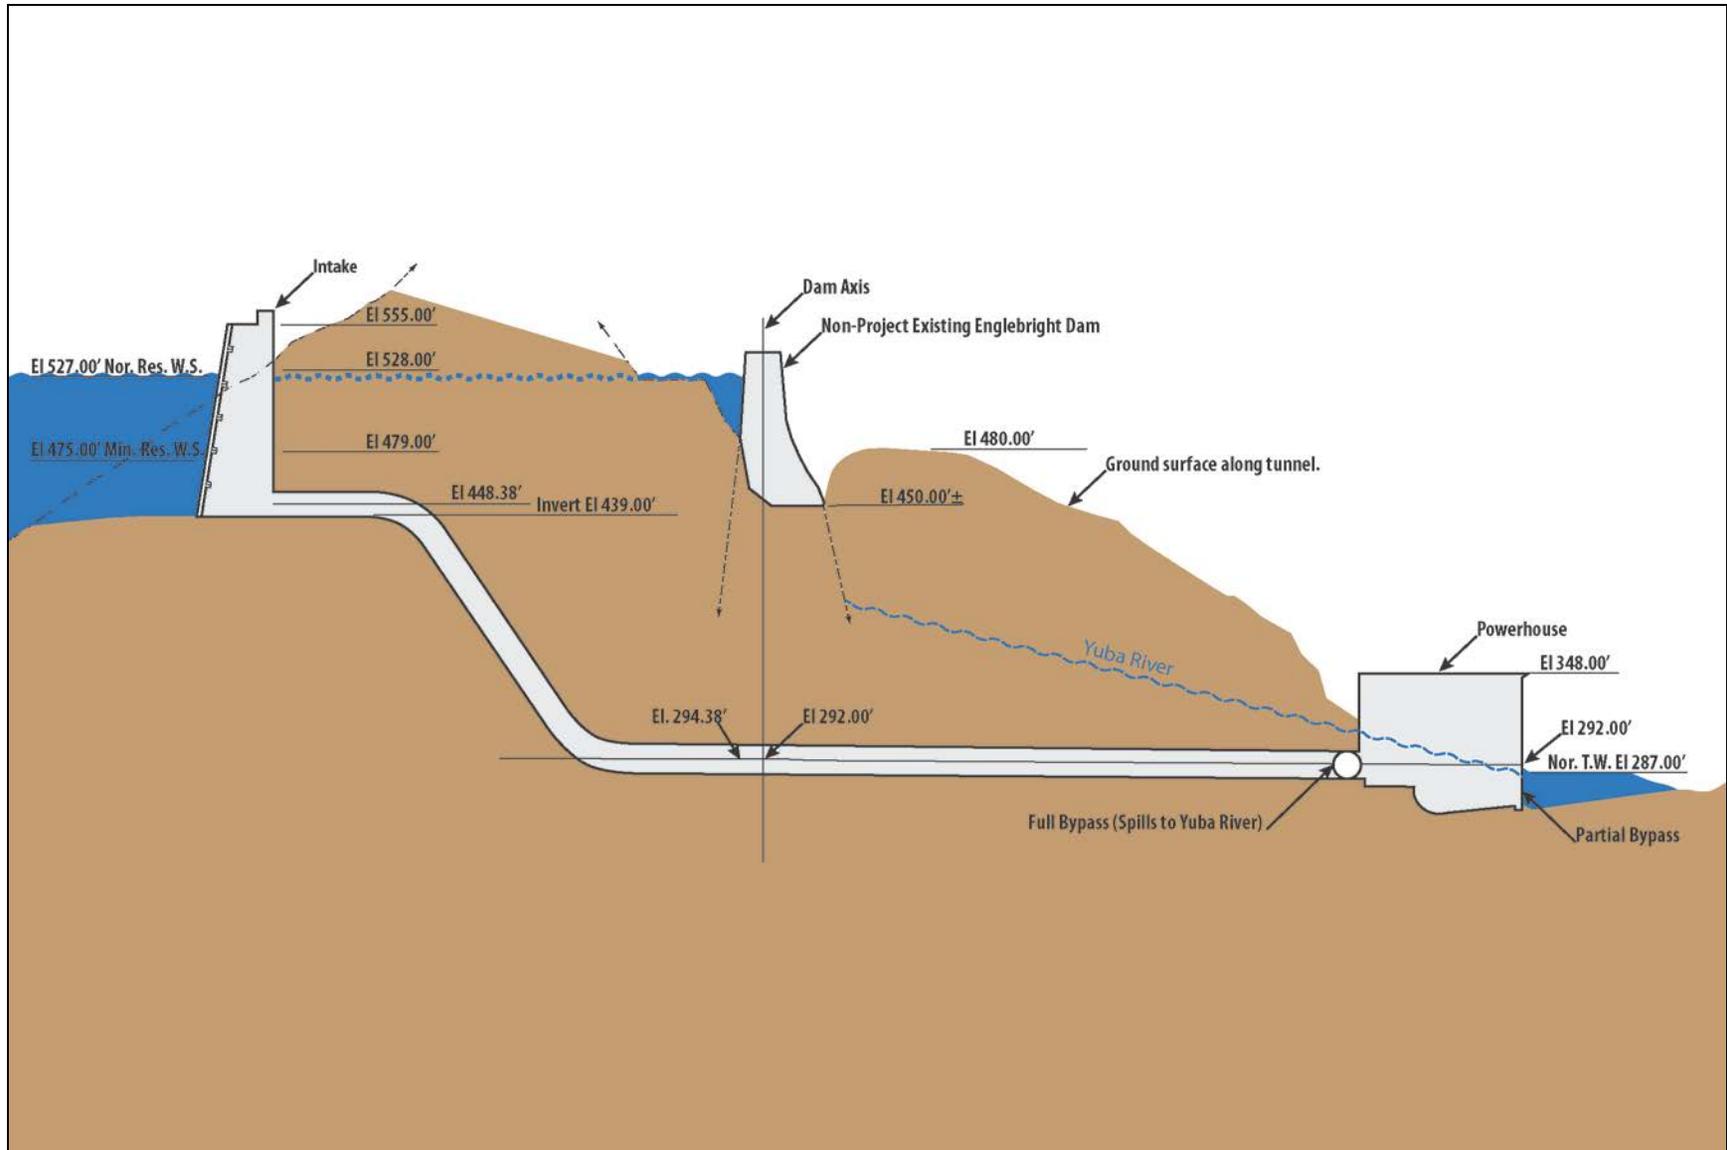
Longitudinal schematic of Narrows 2 Powerhouse Penstock and Powerhouse.
